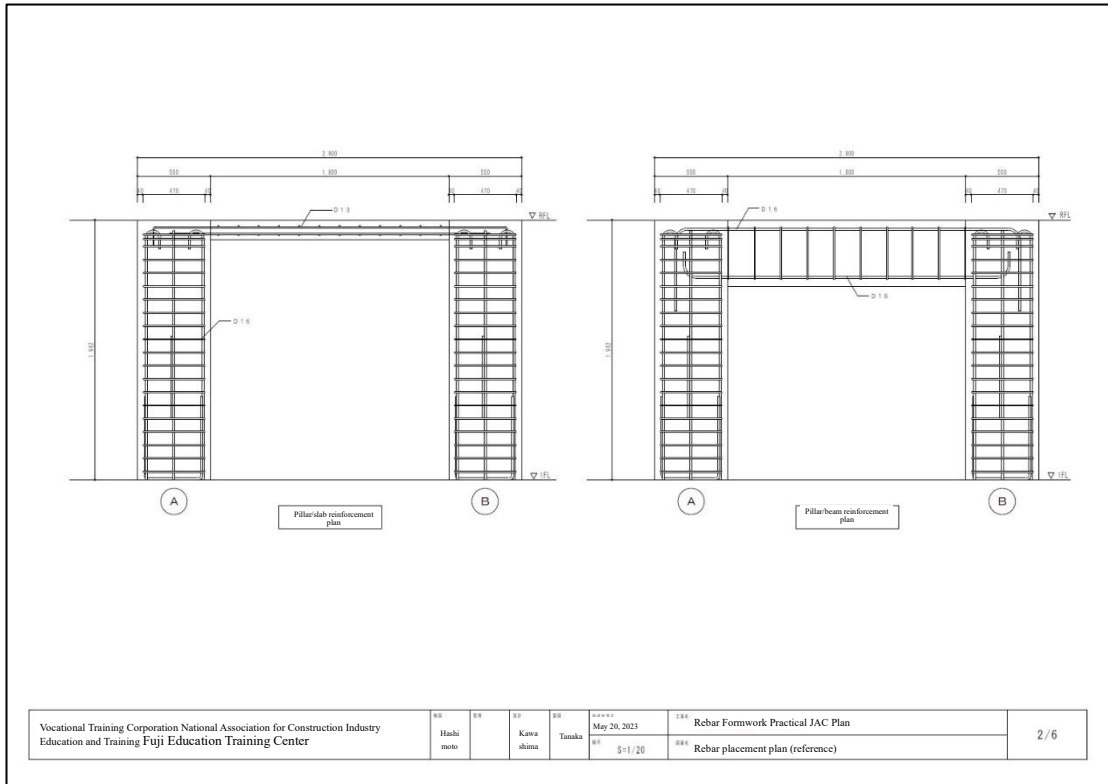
Construction drawing example: pillar/beam reinforcement plan
